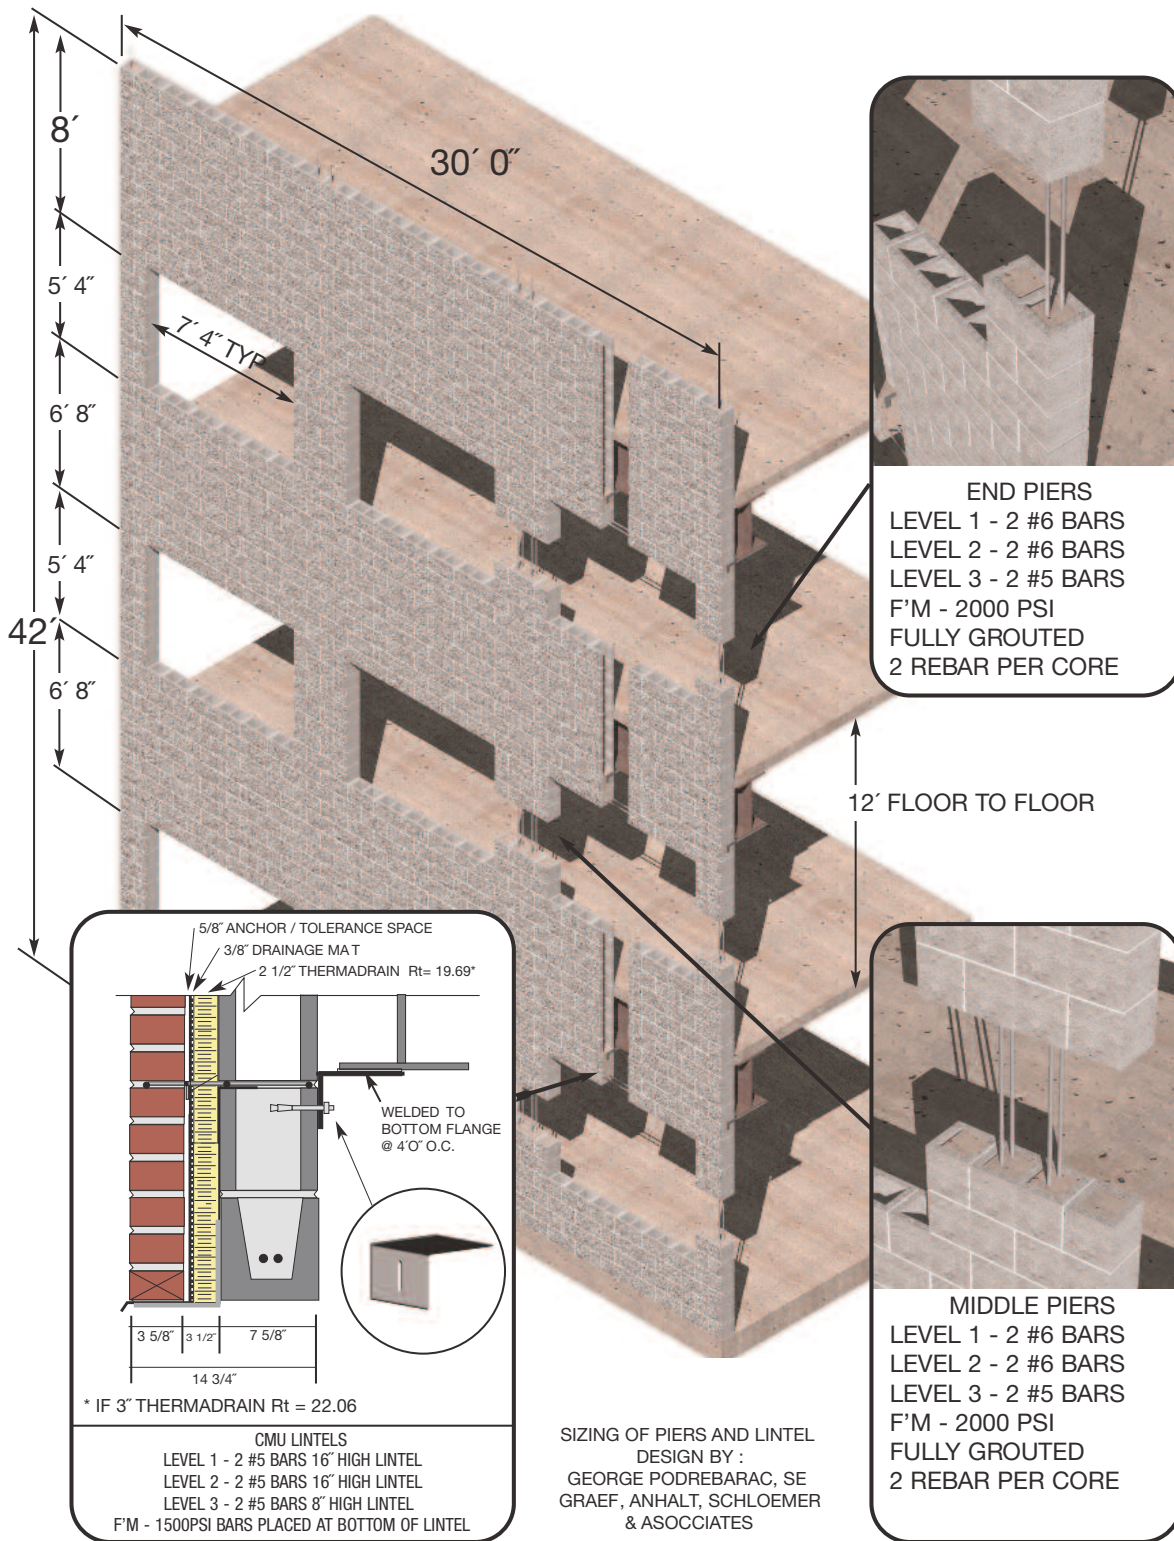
Isometric drawing of the theoretical 42 high wall, attached to a steel frame of the building. The masonry wall must be laterally tied back through the steel frame at the bottom of the edge of the beam for lateral support at each floor level. The wall cross-section and R-value of the proposed walls is laid out for designers' information and design consideration.
